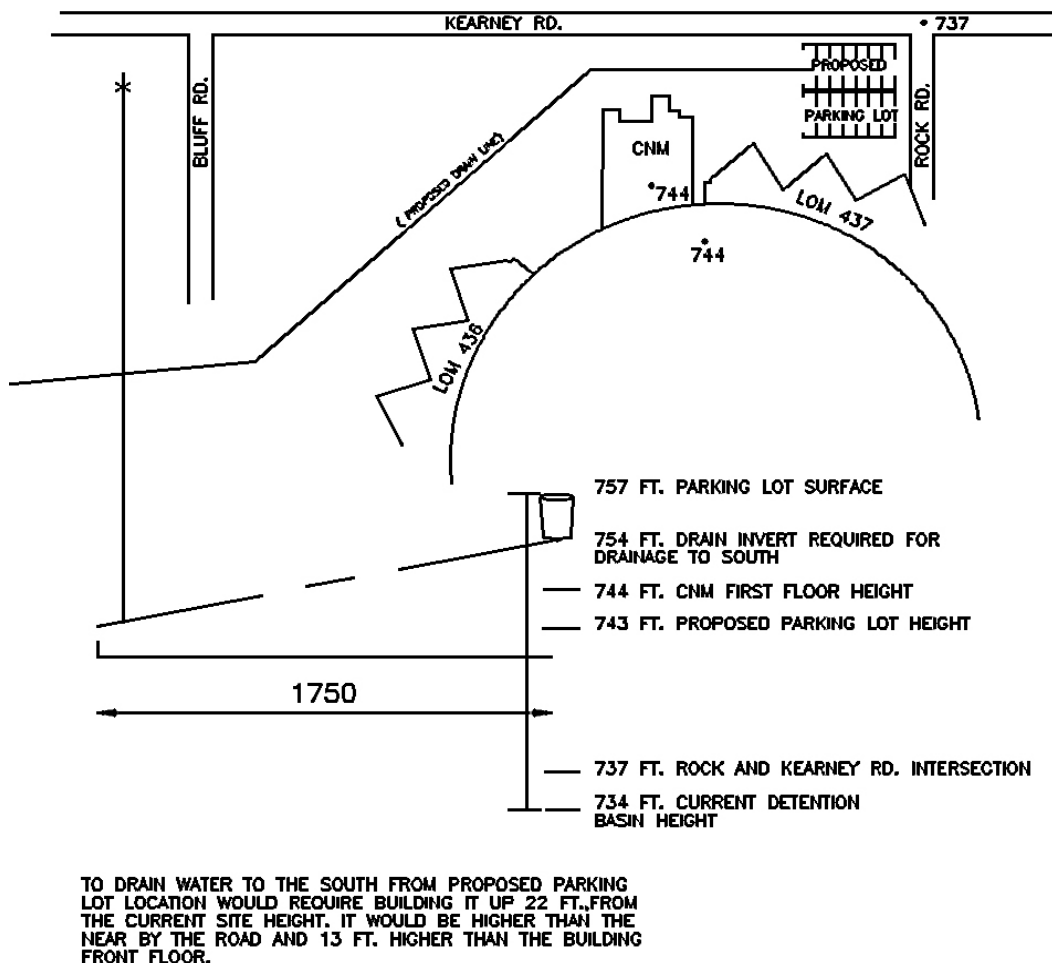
Surface Elevations Associated with Stormwater Drainage Alternatives
